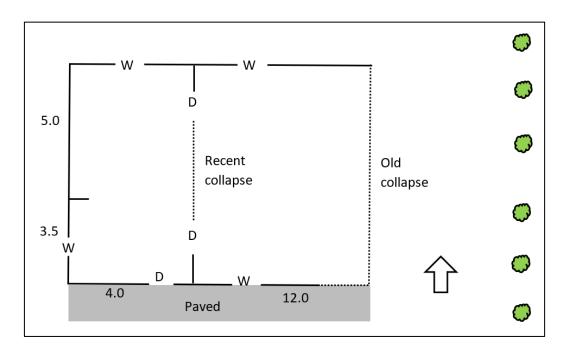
Plan of the remains of the house at waypoint 295. Six cypress trees (now dead) stand to the east of the house.
